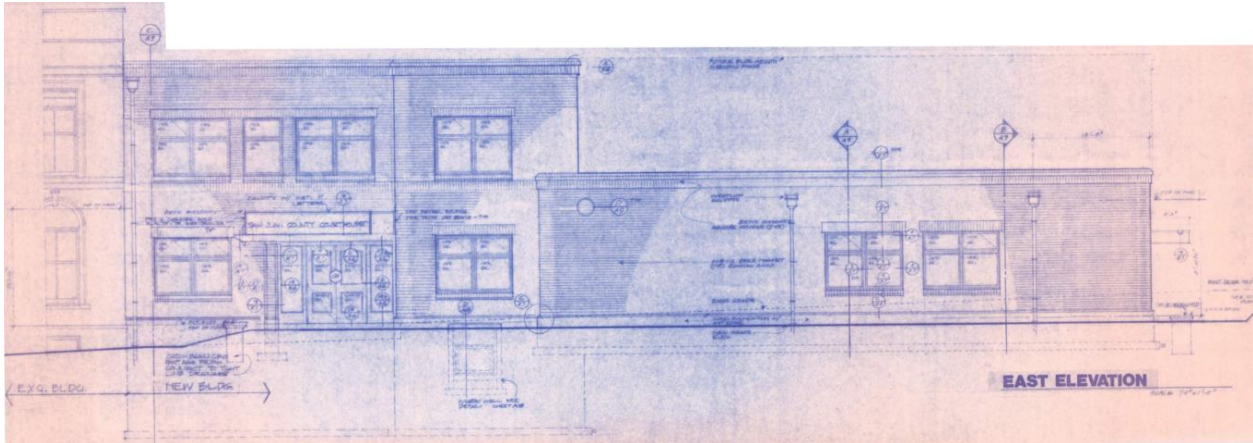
East Elevation of the 1980 courthouse expansion drawings taken from Sheet R-5. The original 1906 era courthouse can be seen on the left (south).
